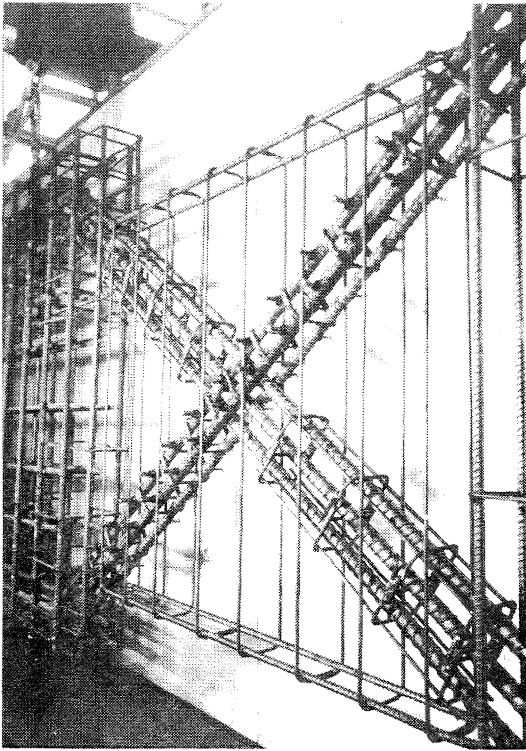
Diagonal Principal Reinforcement in a Deep Spandrel Beam.
